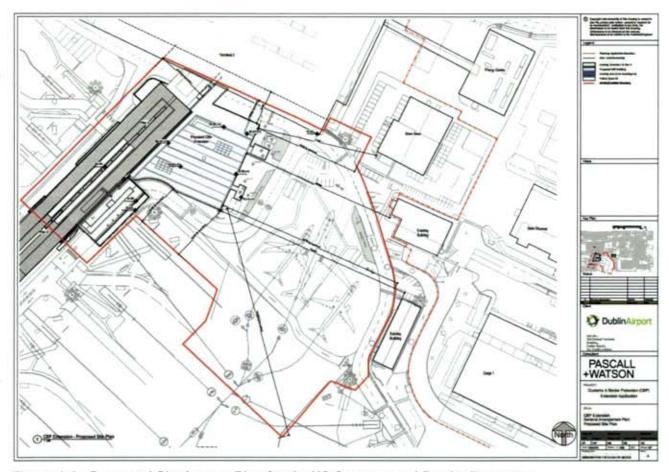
Proposed Site Layout Plan for the US Customs and Border Protection
